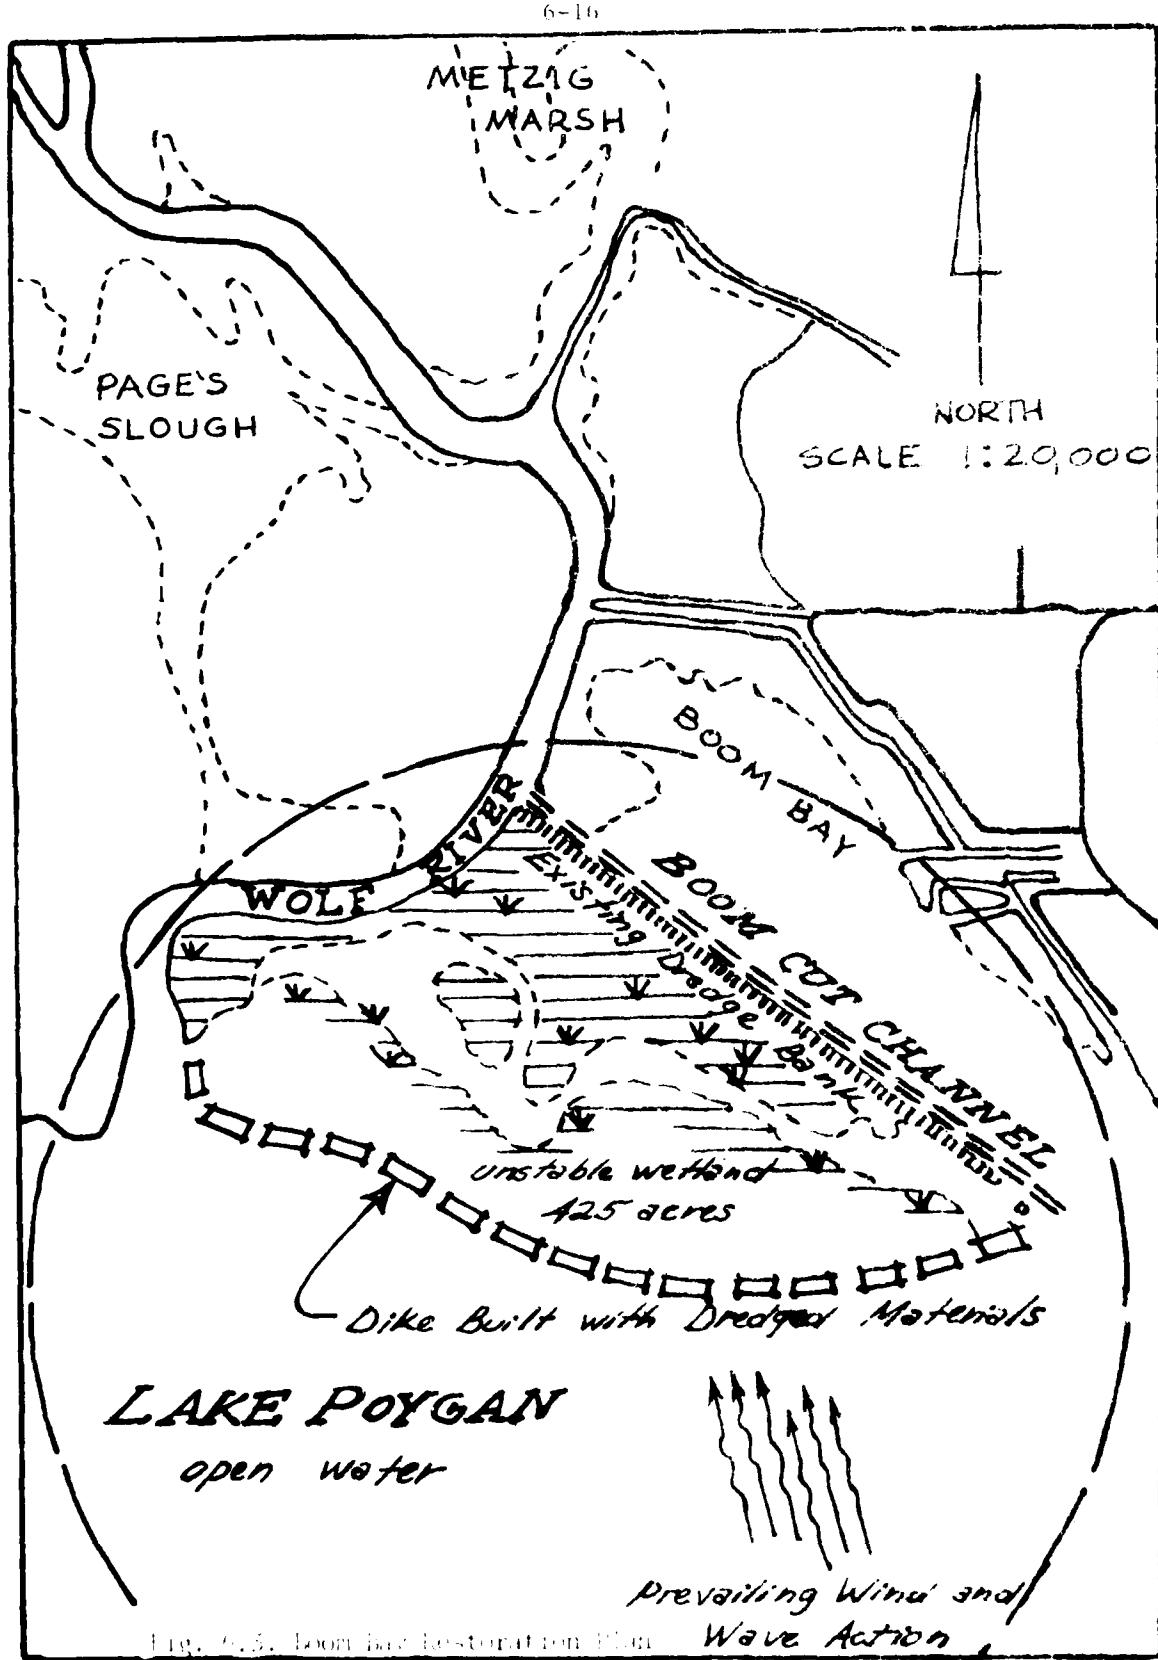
Boom bay restoration plan. Prevailing Wind and Wave Action.
